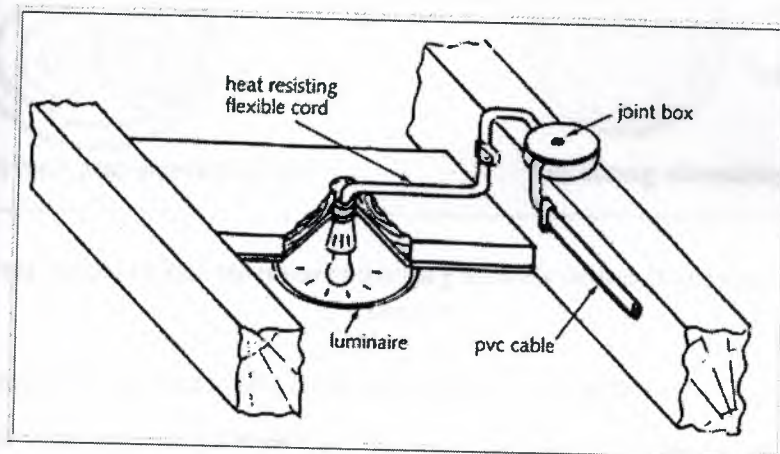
150°C rubber-insulated and braided flexible cord used for the final connection to a luminaire
